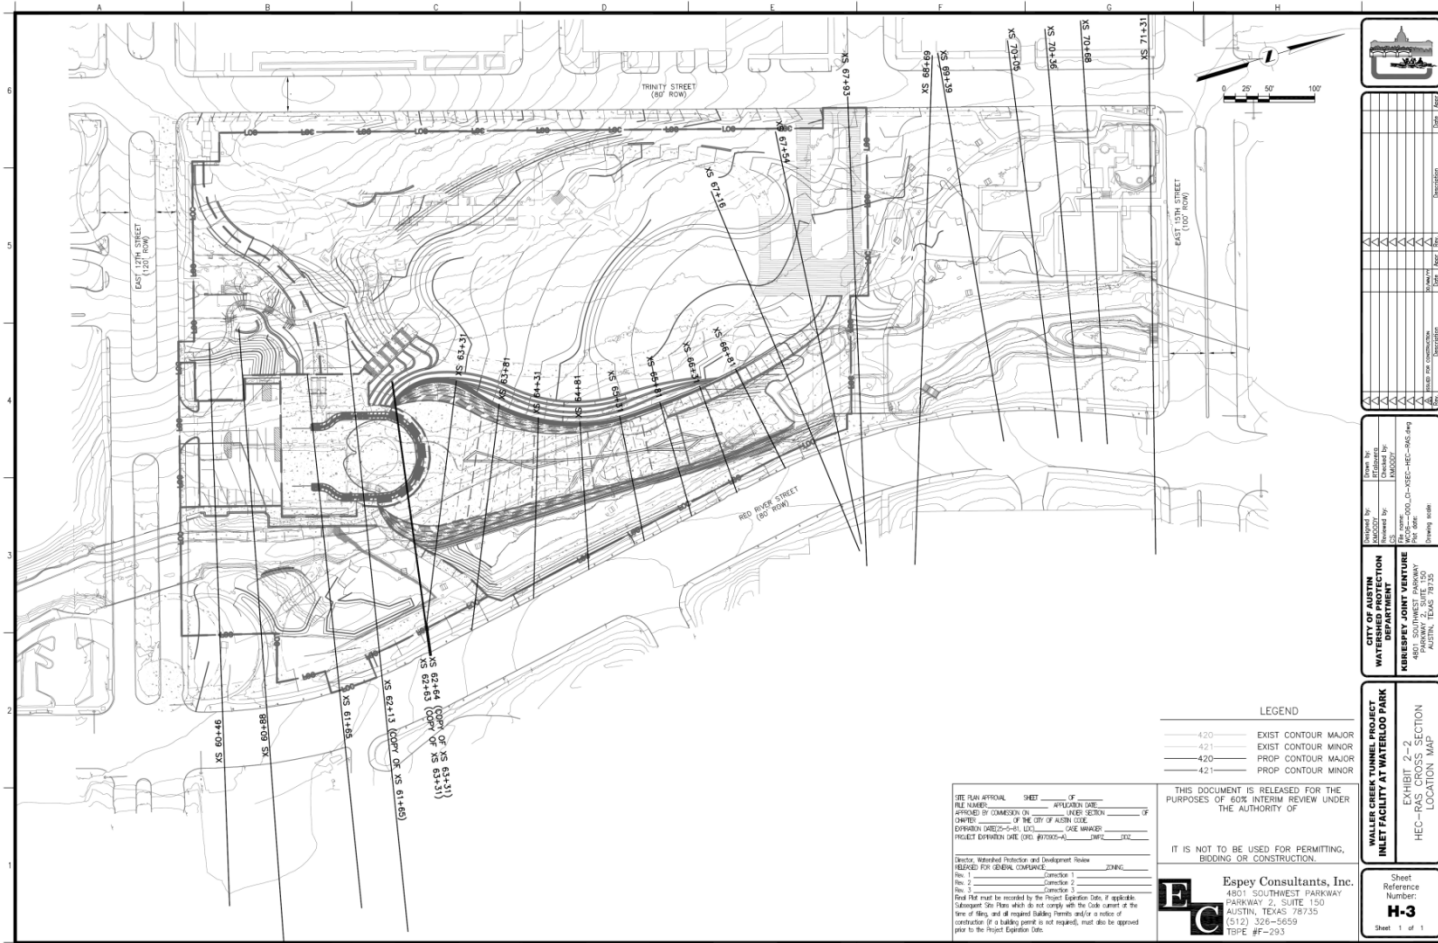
Waller Creek Tunnel Project; Inlet Pool Channelization – Plan View
